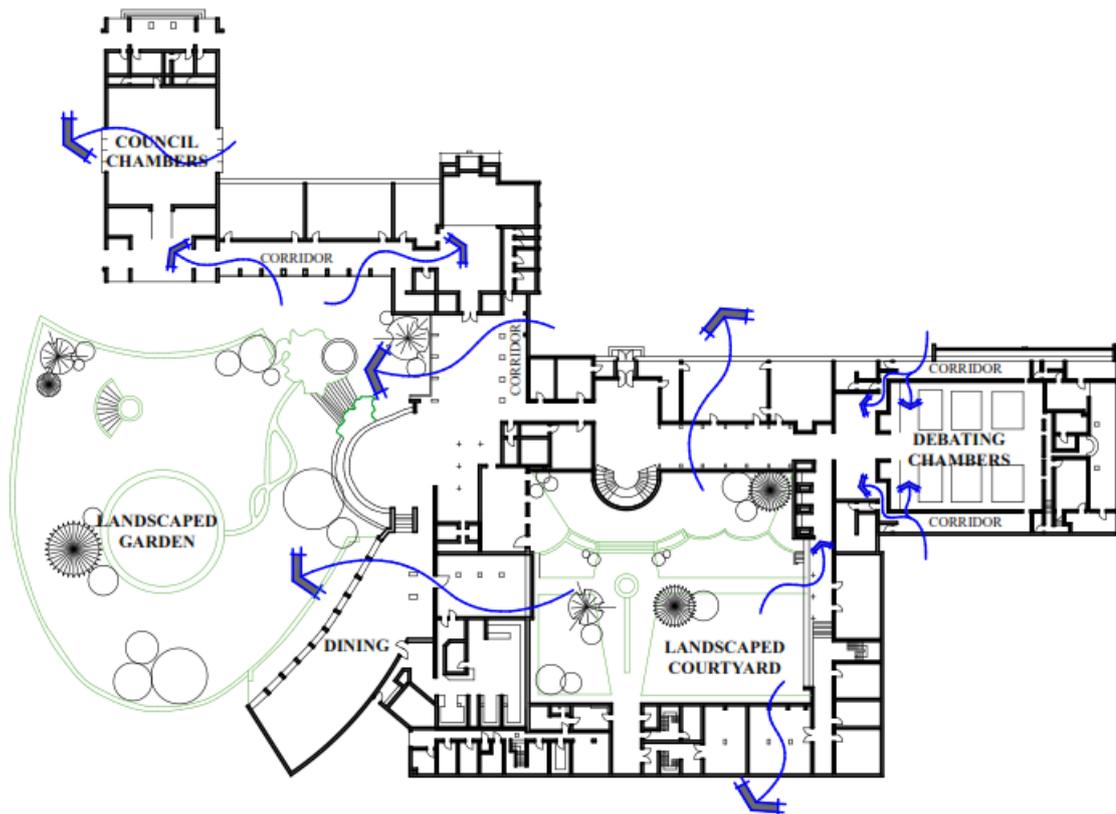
Ground floor plan of the parliament building showing air flow through the building, Nairobi Kenya. Source: Author 2019, (based on Loki 2003)
